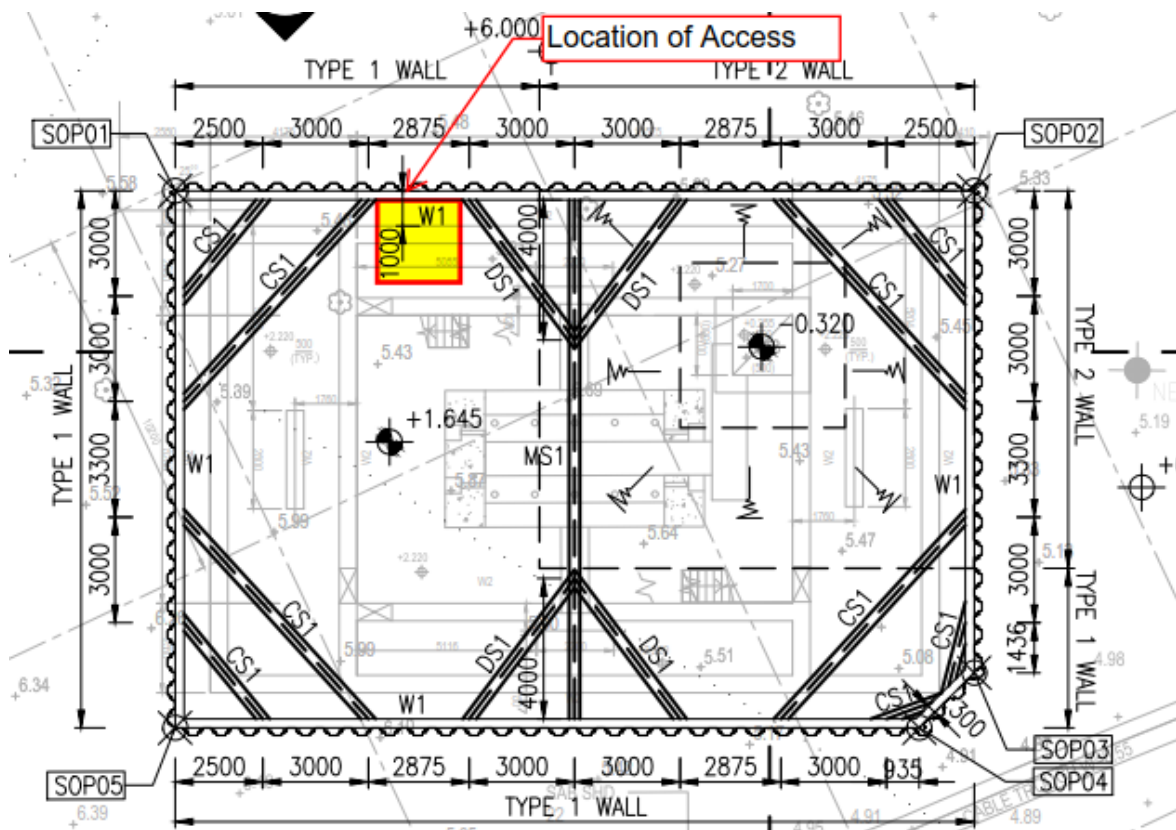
Location Plan showing the Temporary Access from the ground level to the base slab
